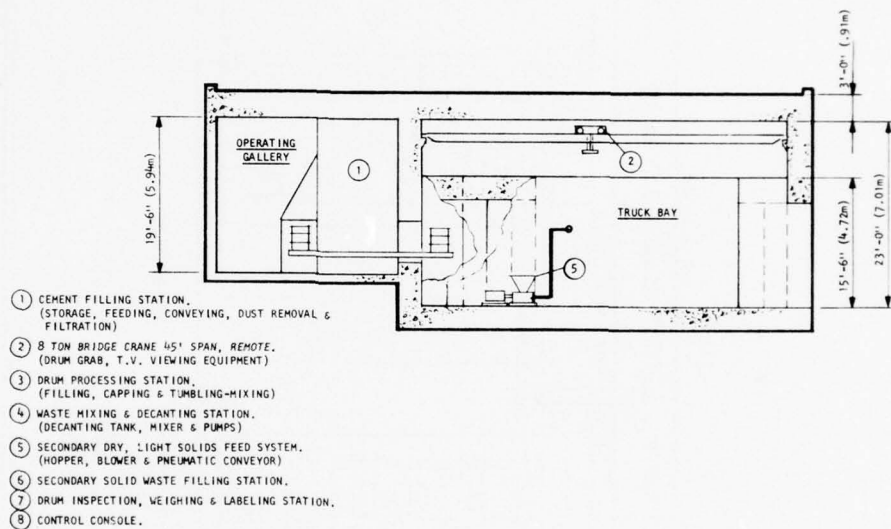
Fuel Reprocessing Plant Cement Immobilization Facility Plan, Section B-B
